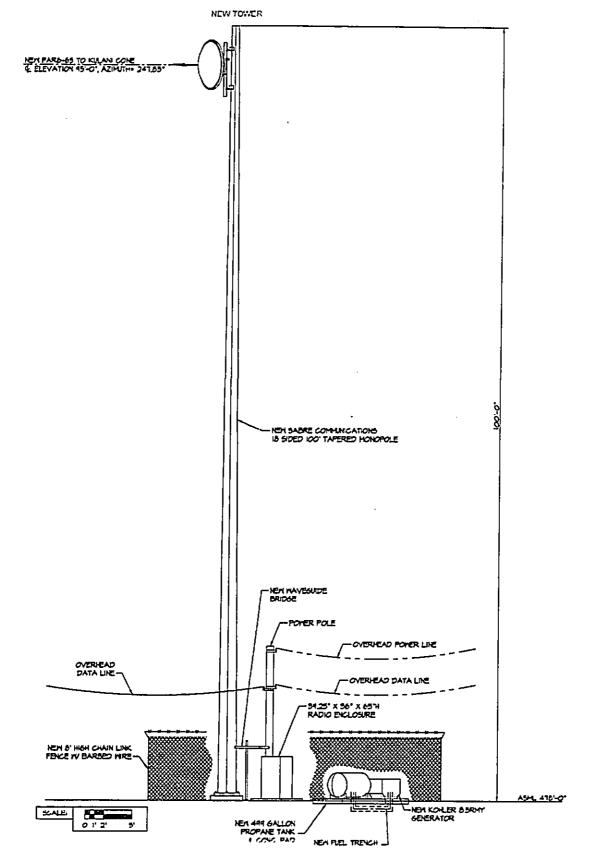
E Puna Police Station / Elevation Plan (looking north)
